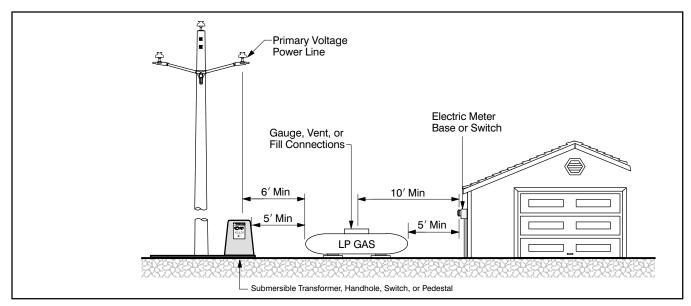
Minimum clearances from LP storage tanks to sources of ignition
